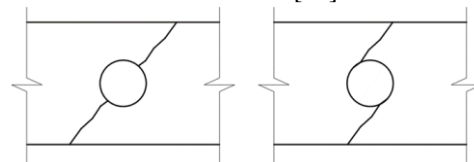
Schematic drawing showing failure modes of a beam with (a) small and (b) large openings in the flexure zone [32]
